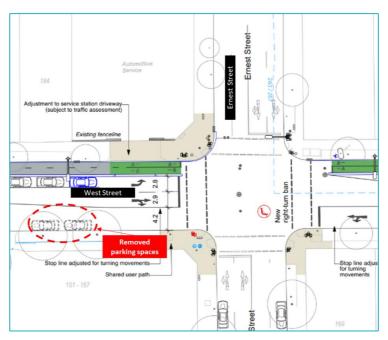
Removed parking spaces near Ernest Street intersection.
